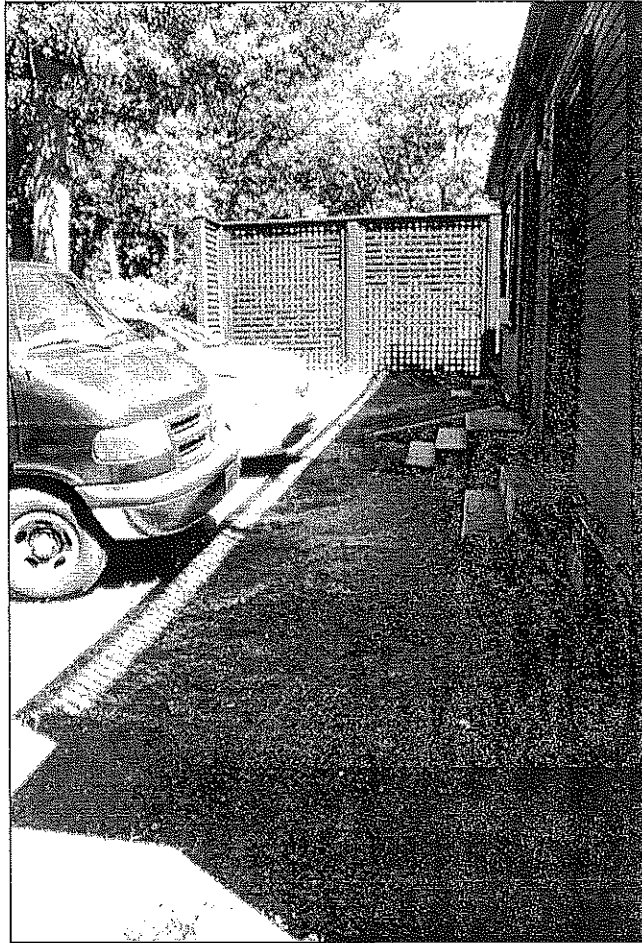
Photograph showing the location of TB-1 through TB-4, view east, Stonehurst project area, Waltham, Massachusetts.
